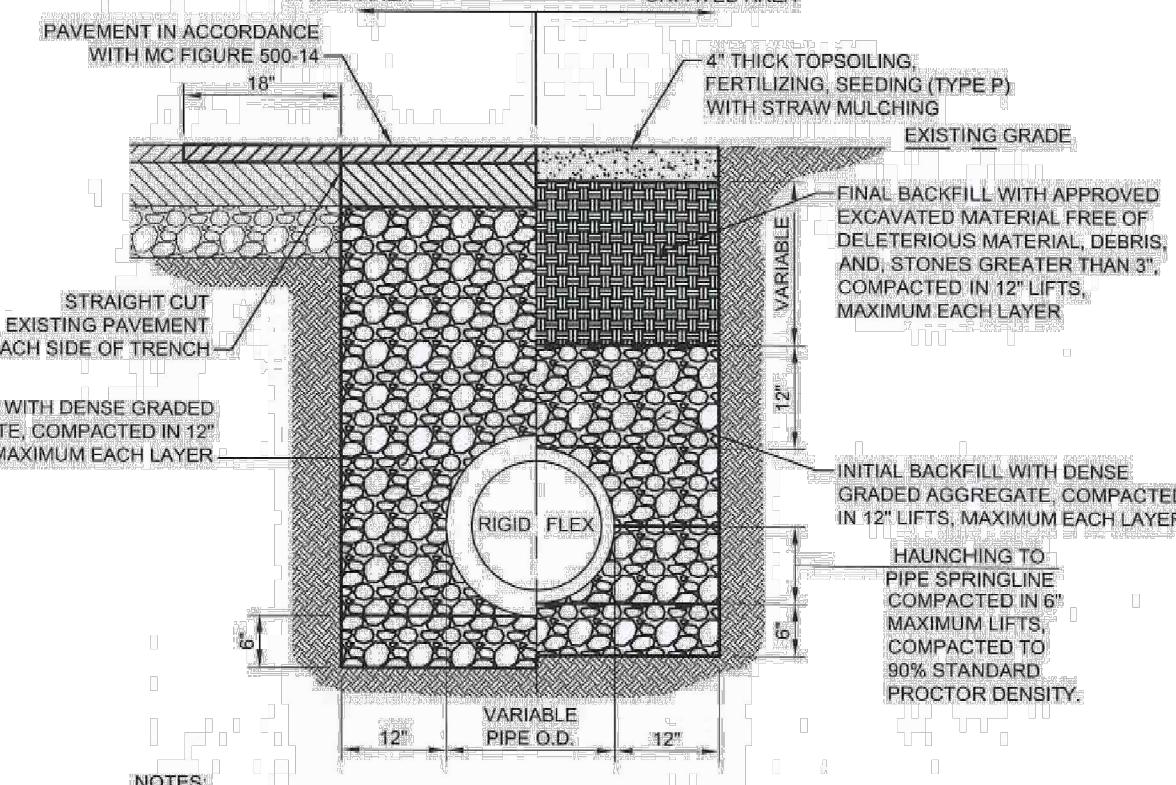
MORRIS COUNTY TYPICAL DETAIL TRENCH DETAIL NOT TO SCALE 5/2011 MOC
